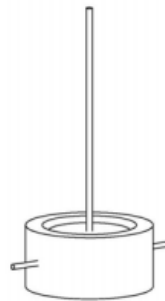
Schematic of pull out test specimens. Perry and Weiss (2009).
